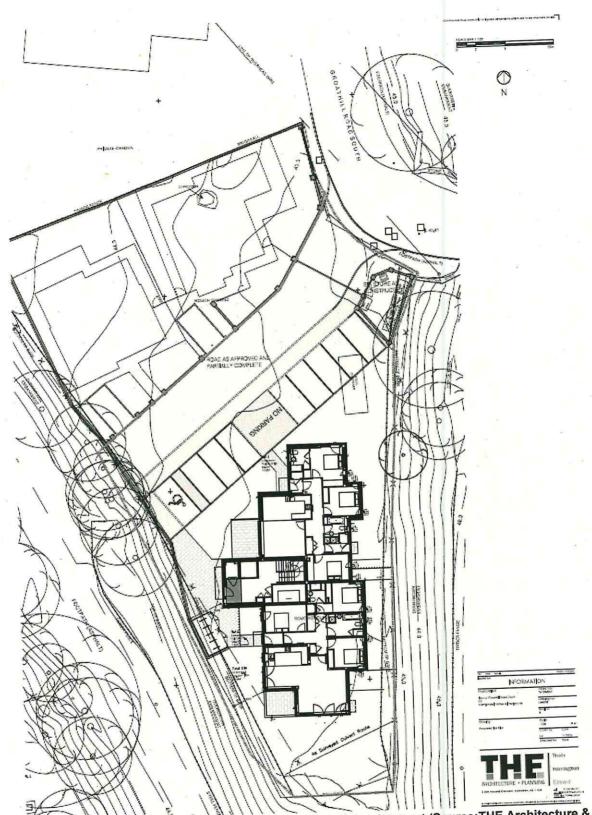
Indicative site plan of the Groathill Road South development (Source:THE Architecture & Planning)
